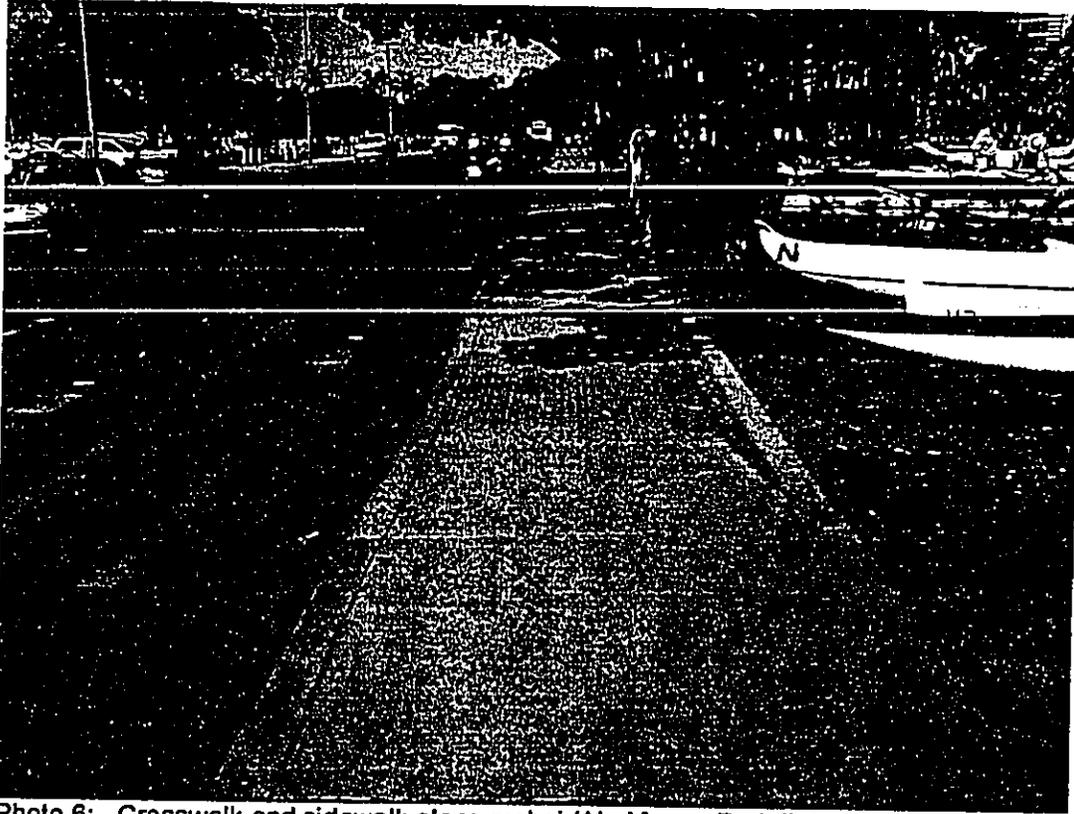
Crosswalk and sidewalk along makai (Ala Moana Park Drive) edge of site.
